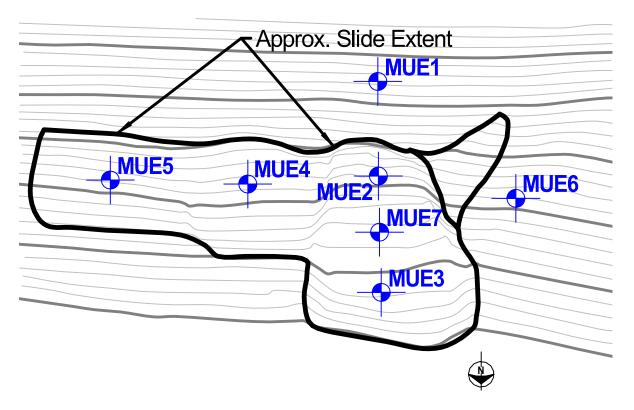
Plan view of I435-Wornall Road site showing approximate boring locations.
